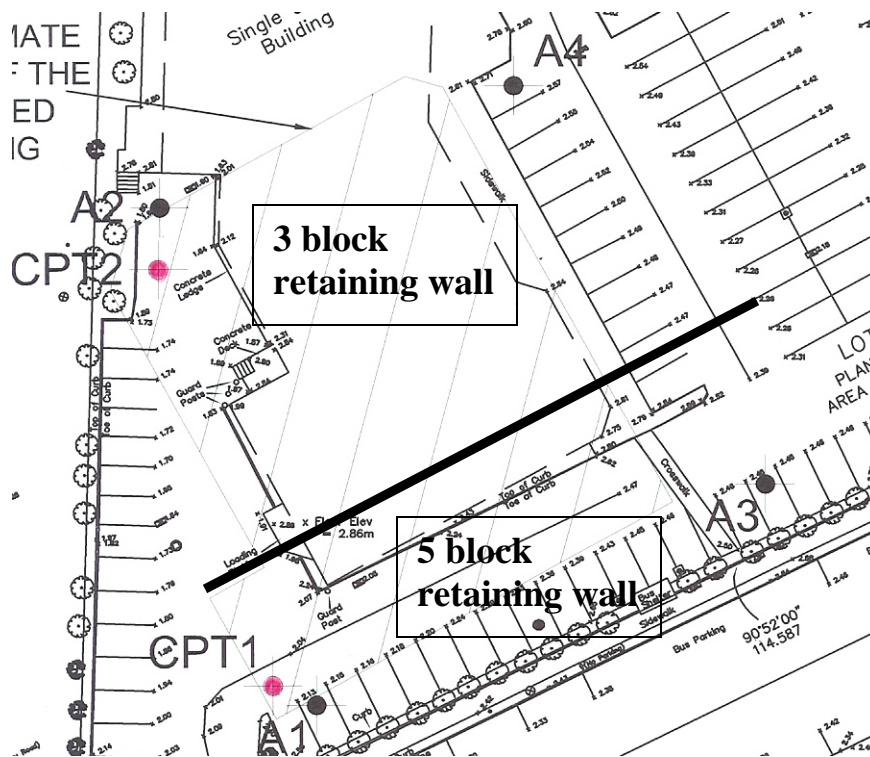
Illustration of the number of retaining wall blocks required for the site.
